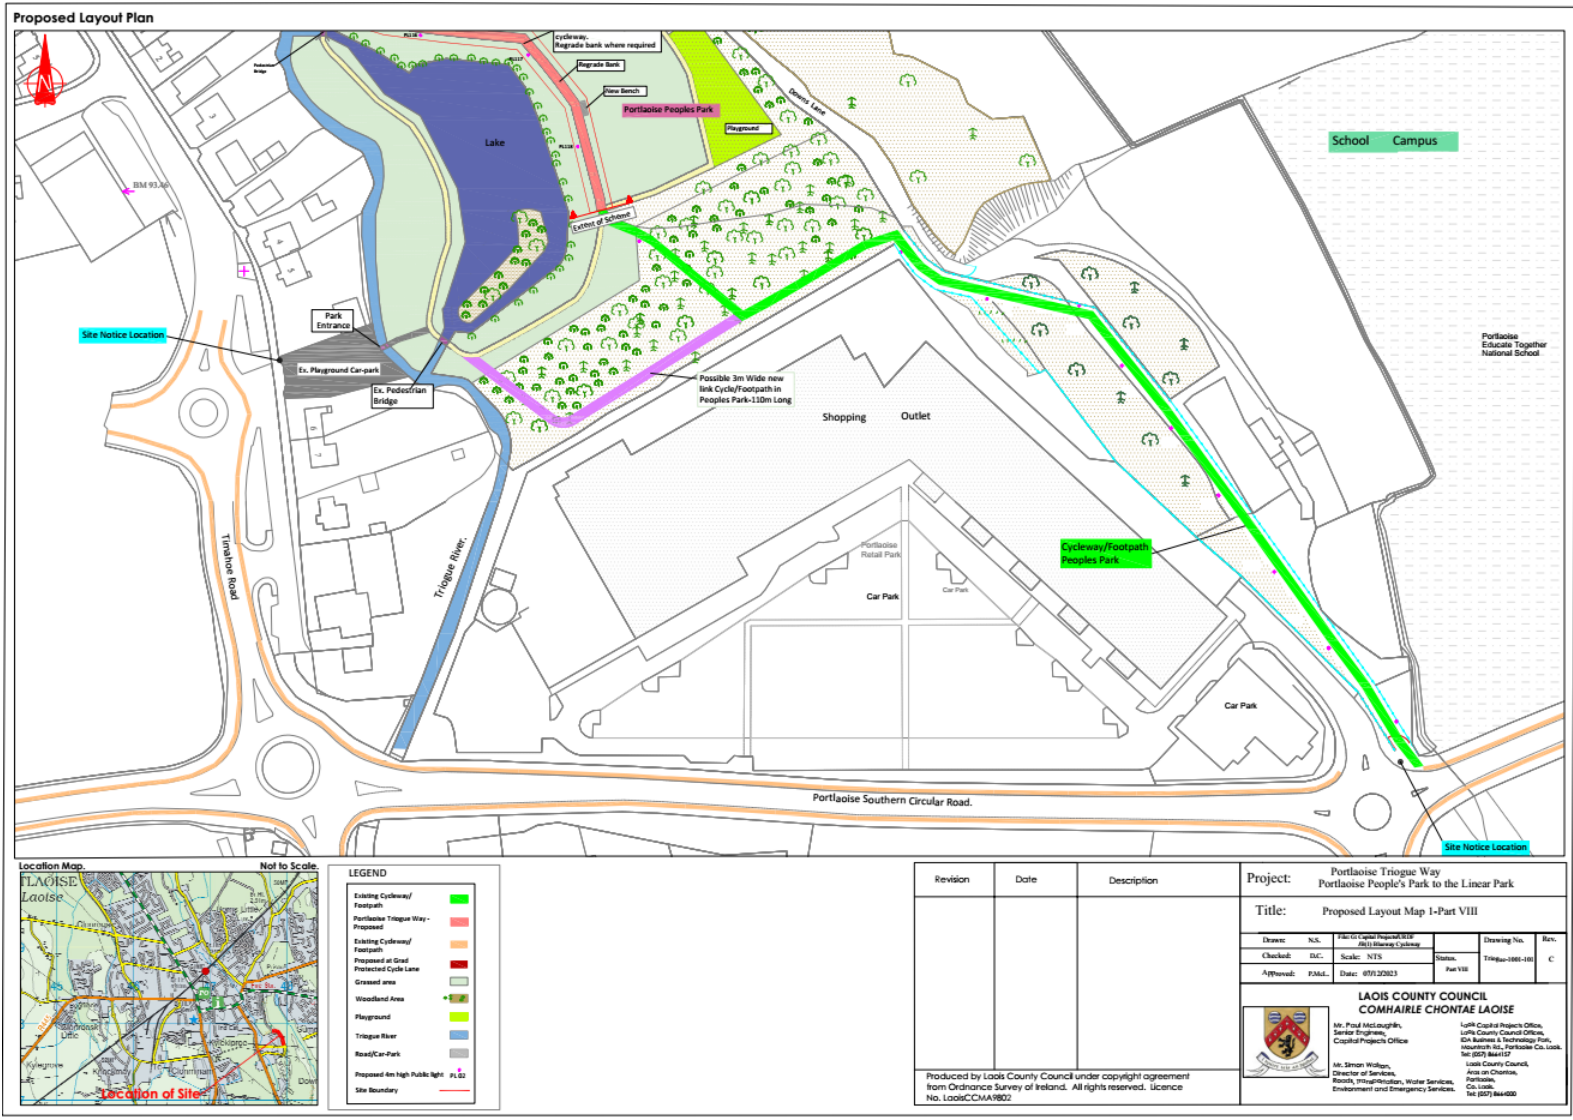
Proposed Scheme Layout (1 of 6)
